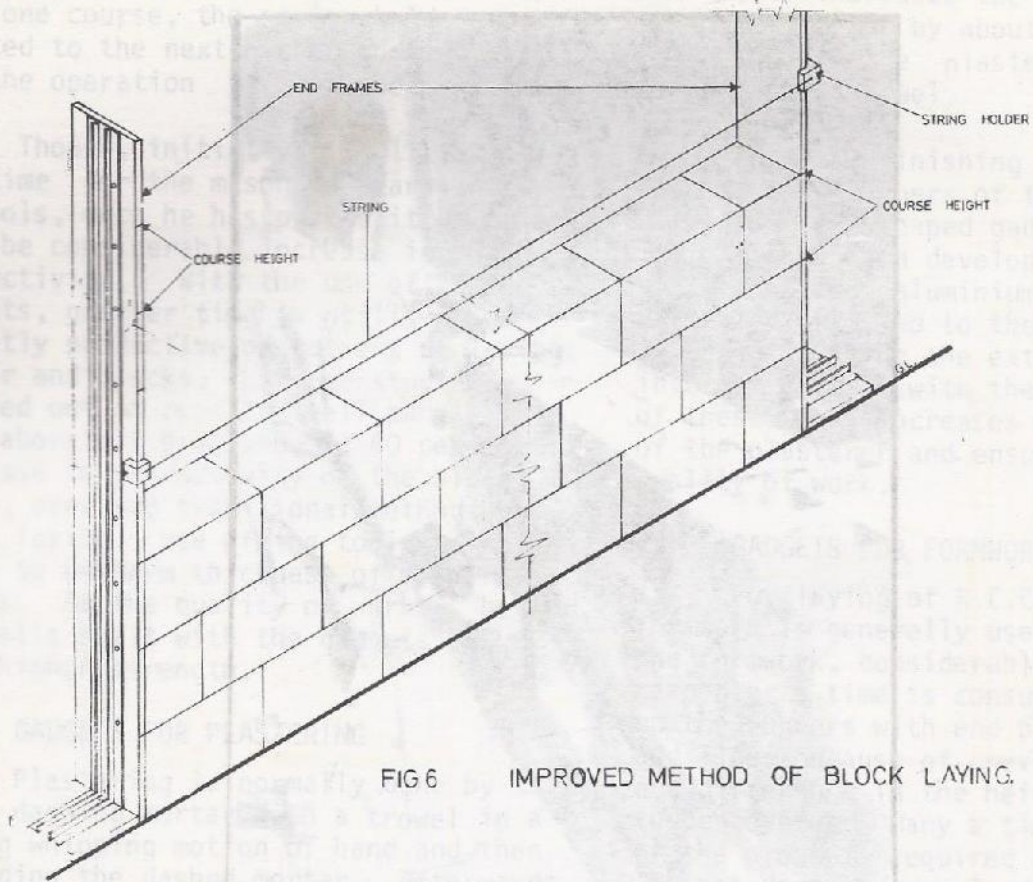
IMPROVED METHOD OF BLOCK LAYING.
